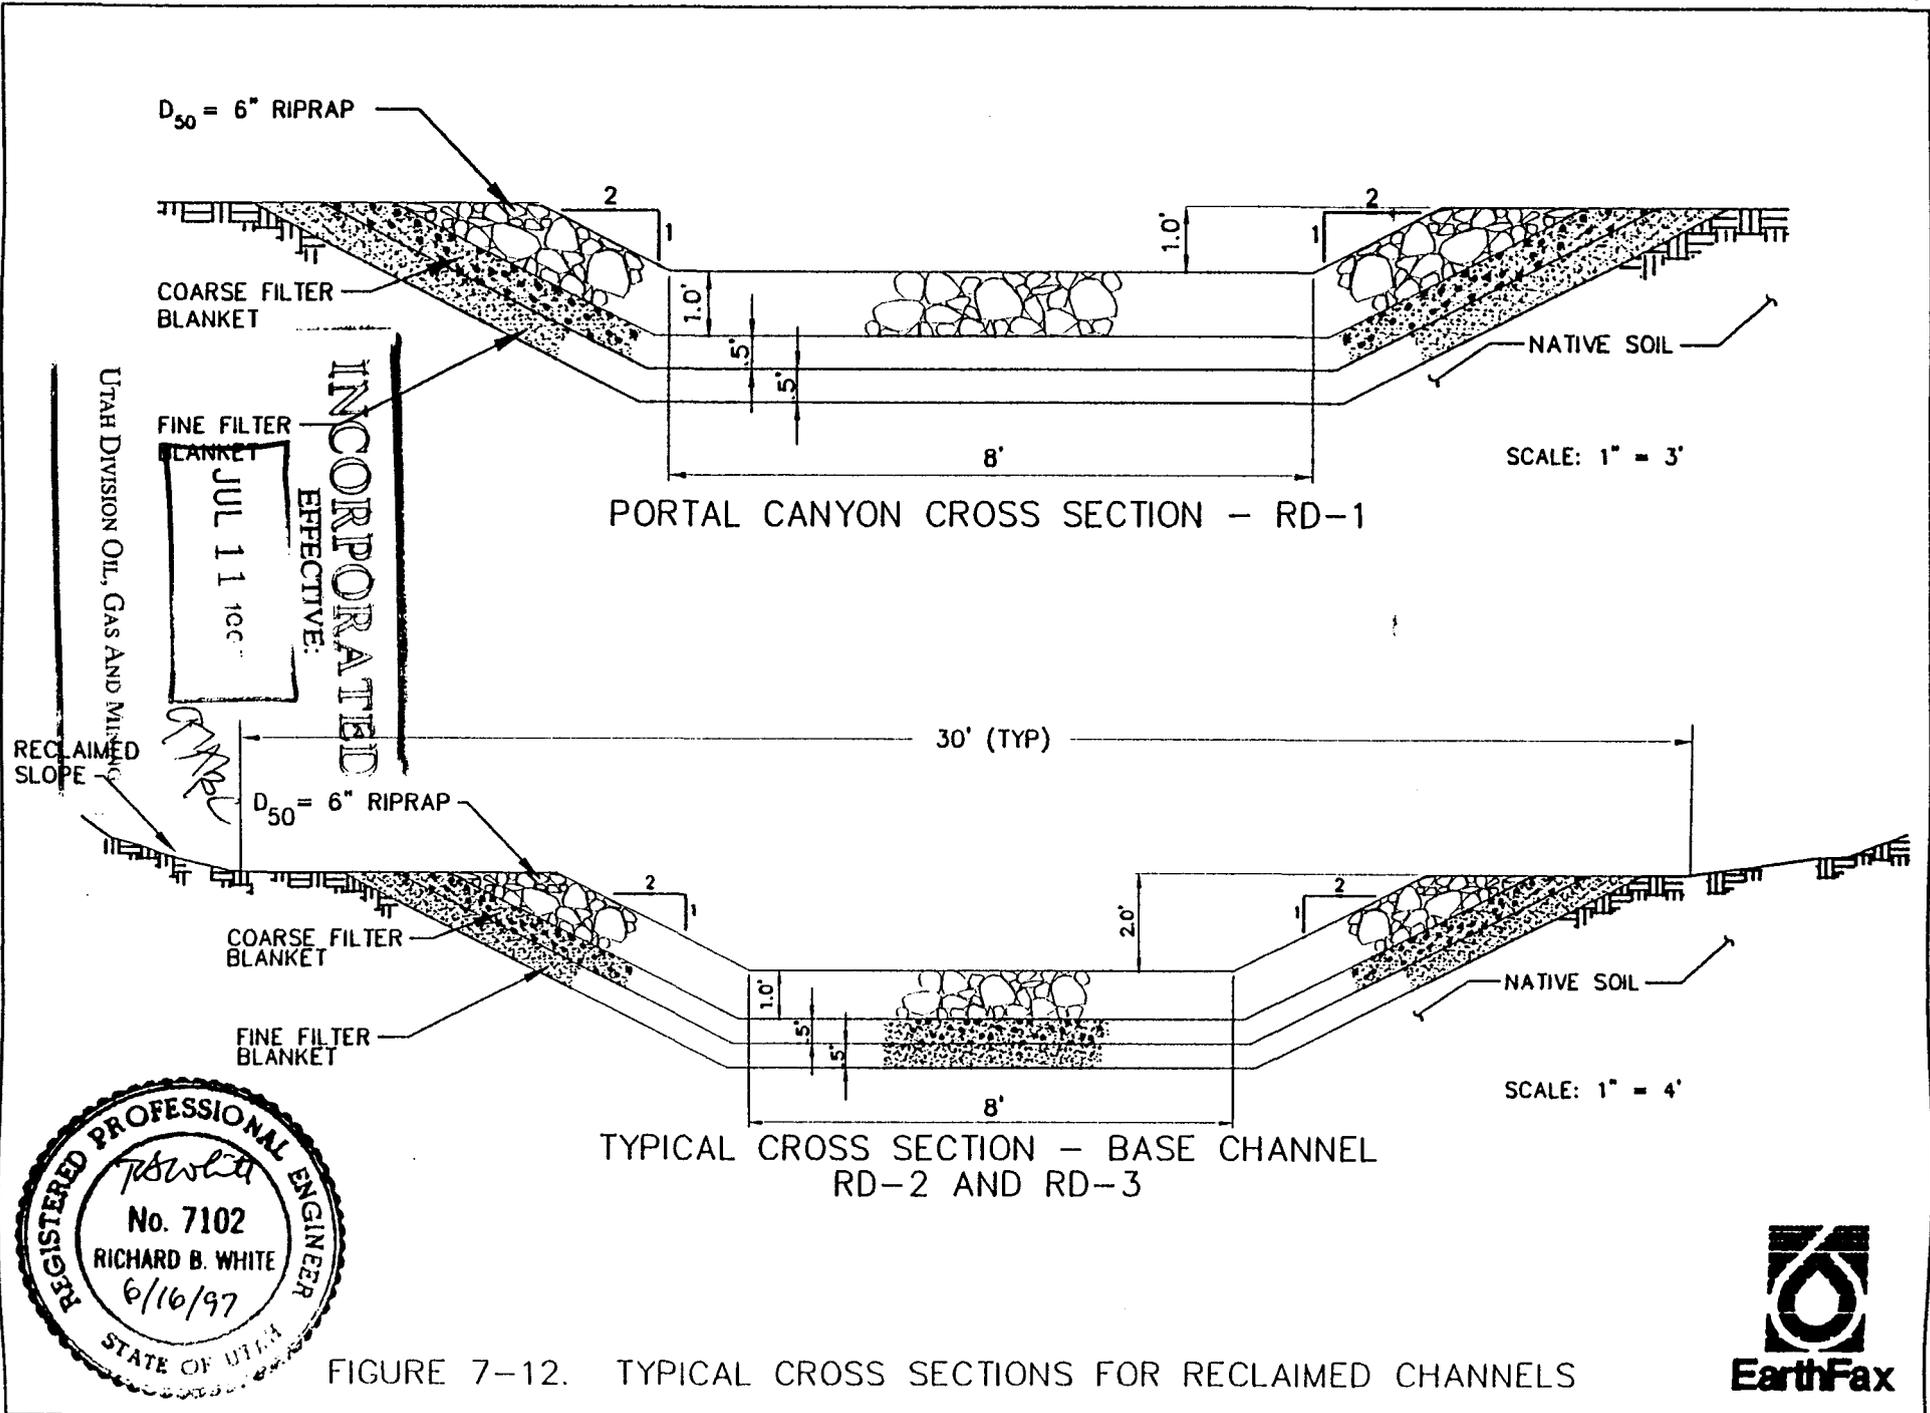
TYPICAL CROSS SECTIONS FOR RECLAIMED CHANNELS
